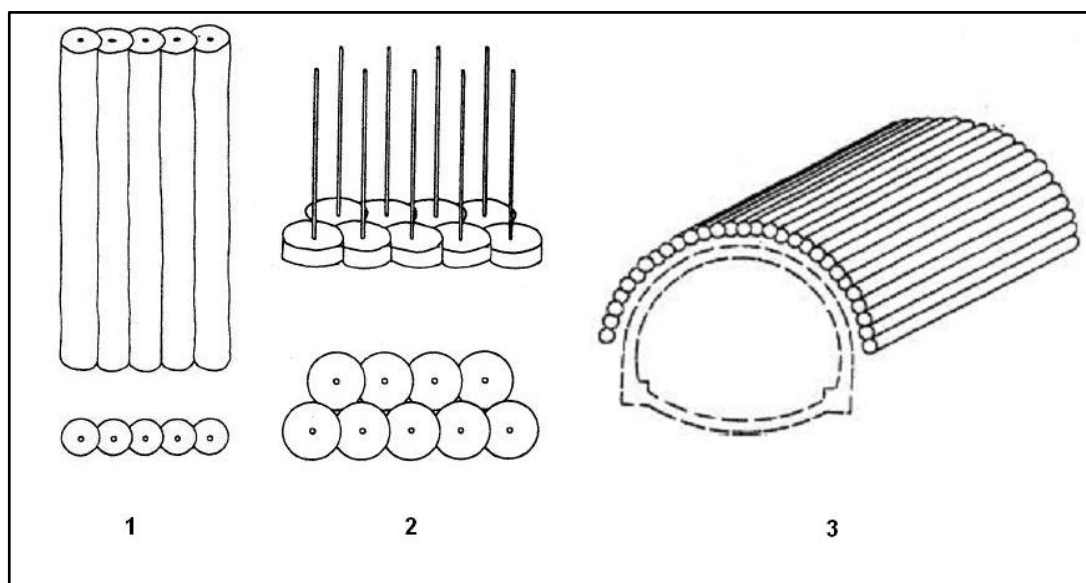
3. Jet grouting structures; diaphragm wall (1), slab (2) and canopy (3). (TS EN 12716)
